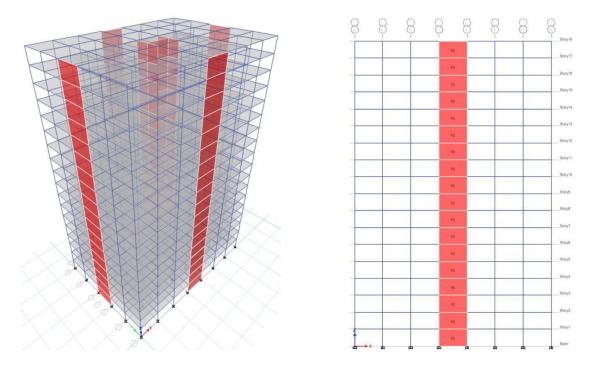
Perspective and 1-1 cross-sectional view of the 18-story building
